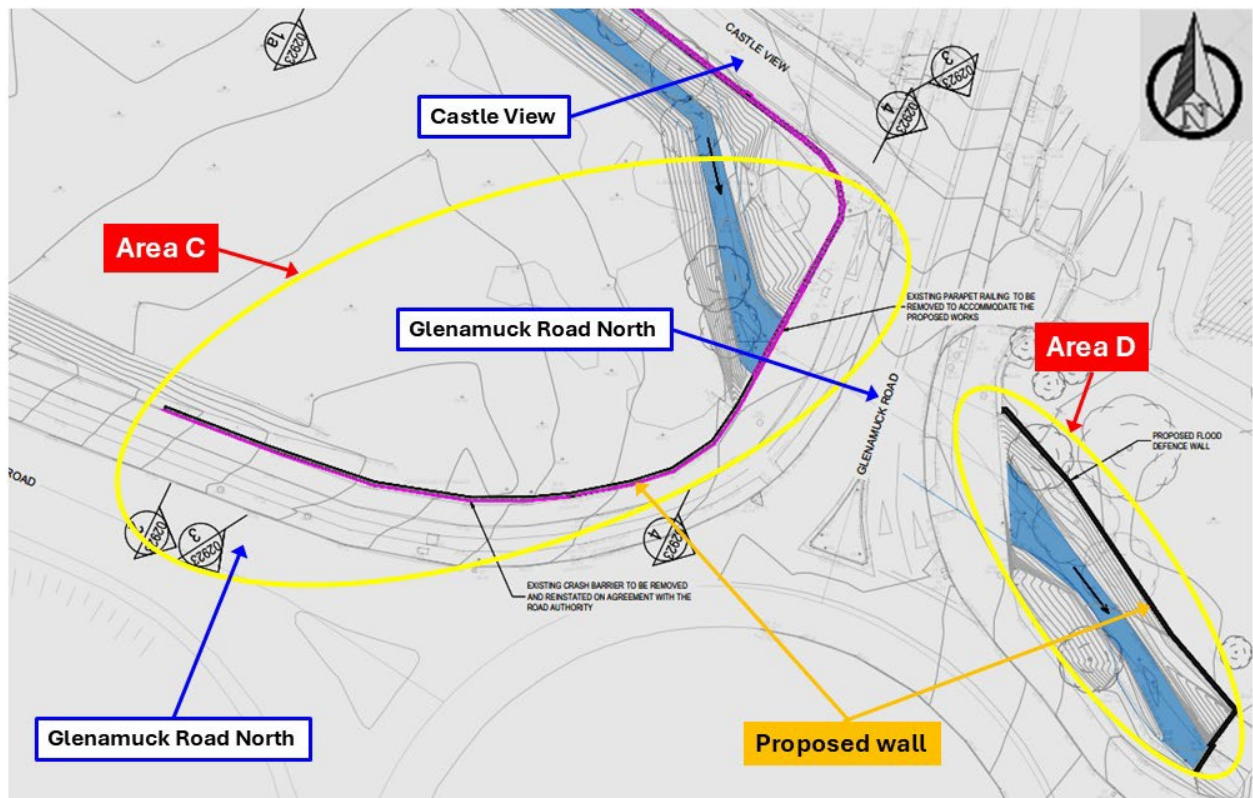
Section of Proposed Works at Glenamuck Road North (Part 2 of 2)
